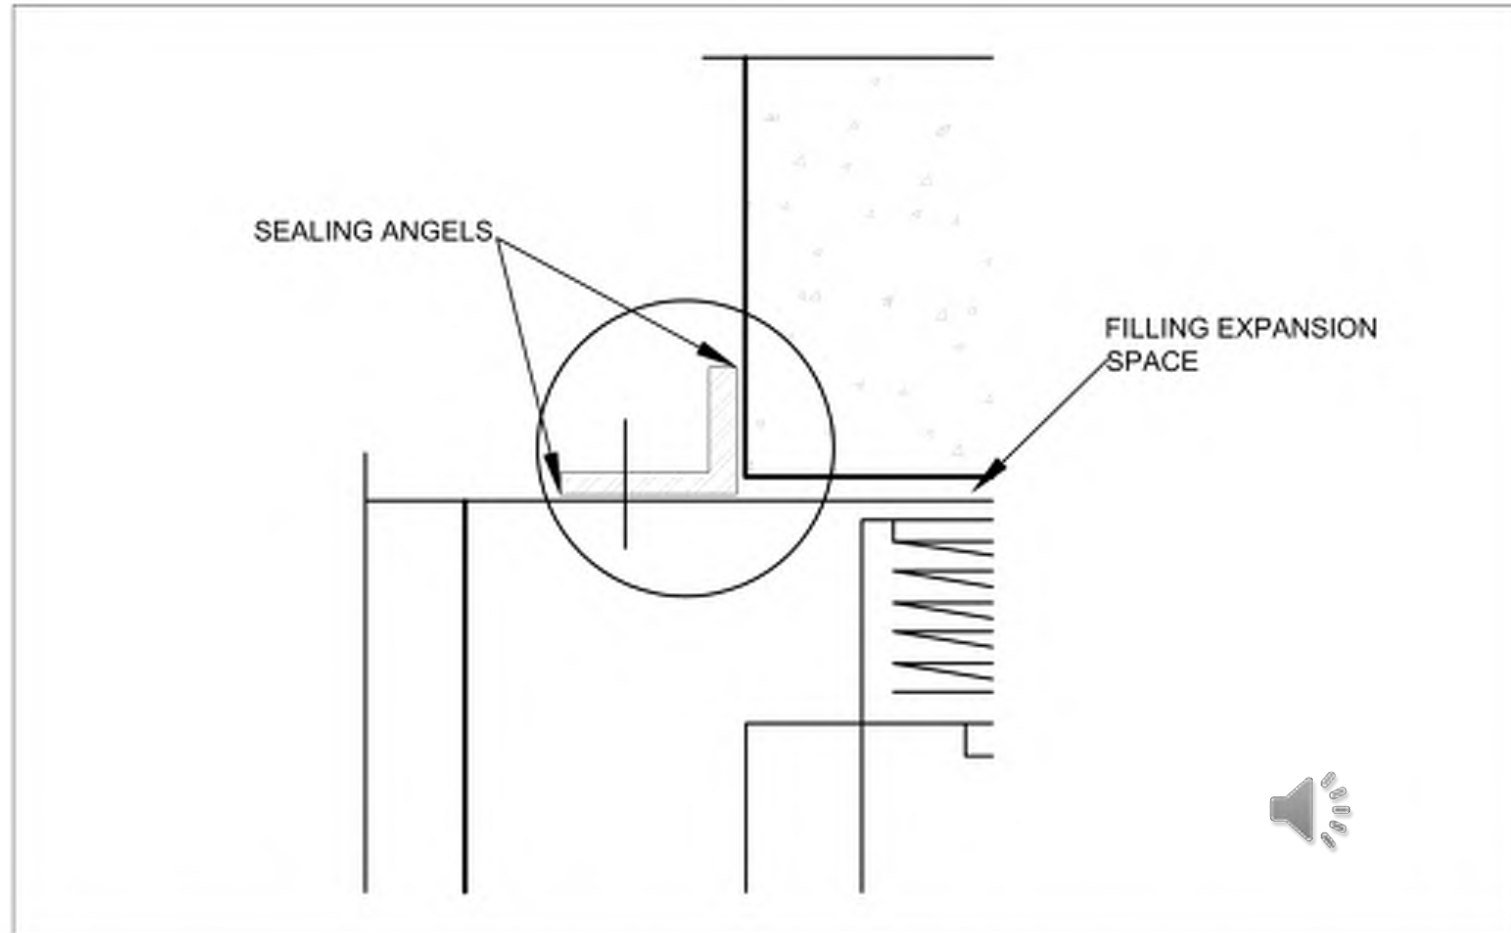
UNTESTED DAMPER ALTERATIONS
